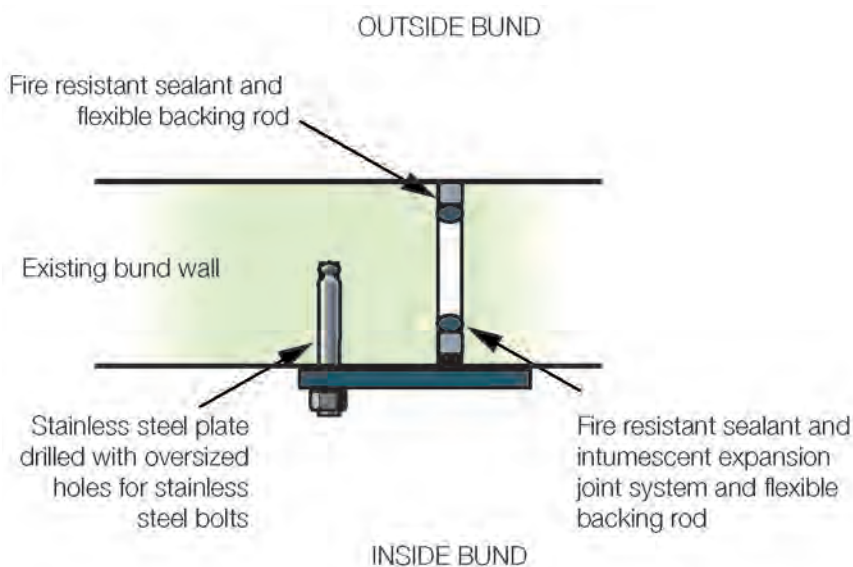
Wall plate joint detail (from HSE, 2009)
